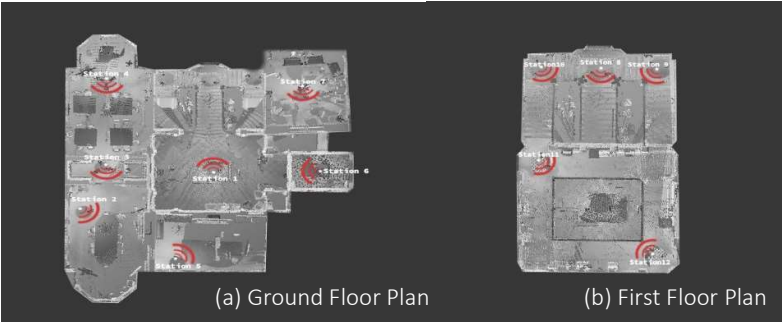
Headington Hill building plan: (a) ground floor plan; (b) first floor main hall plan
